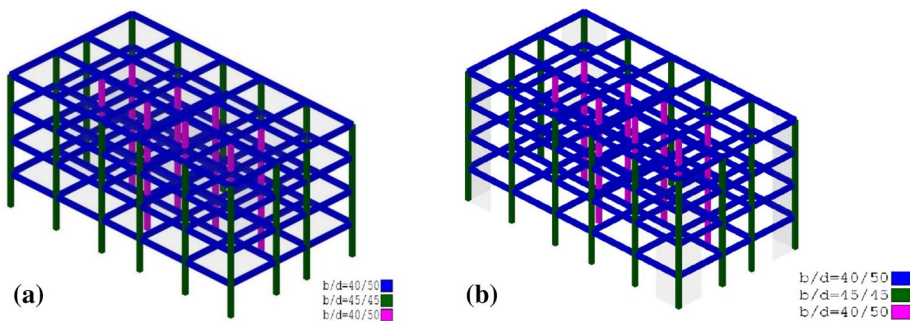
Low-rise building models with dimensions of frame elements [cm]. a Low-rise regular frame structure (LRR-FS); b low-rise regular frame structure with shear-wall (LRR-FS-SW)
